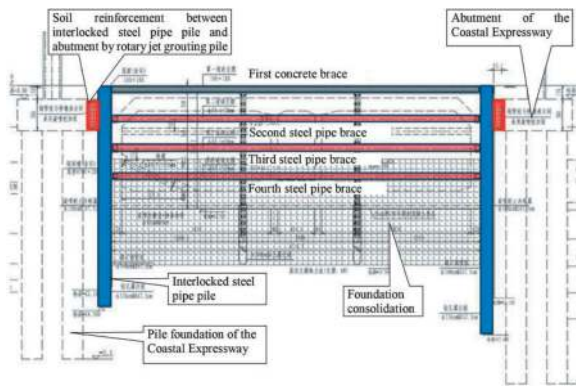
Cross section of brace and retaining structure of the tunnel passing through Coastal Expressway.
